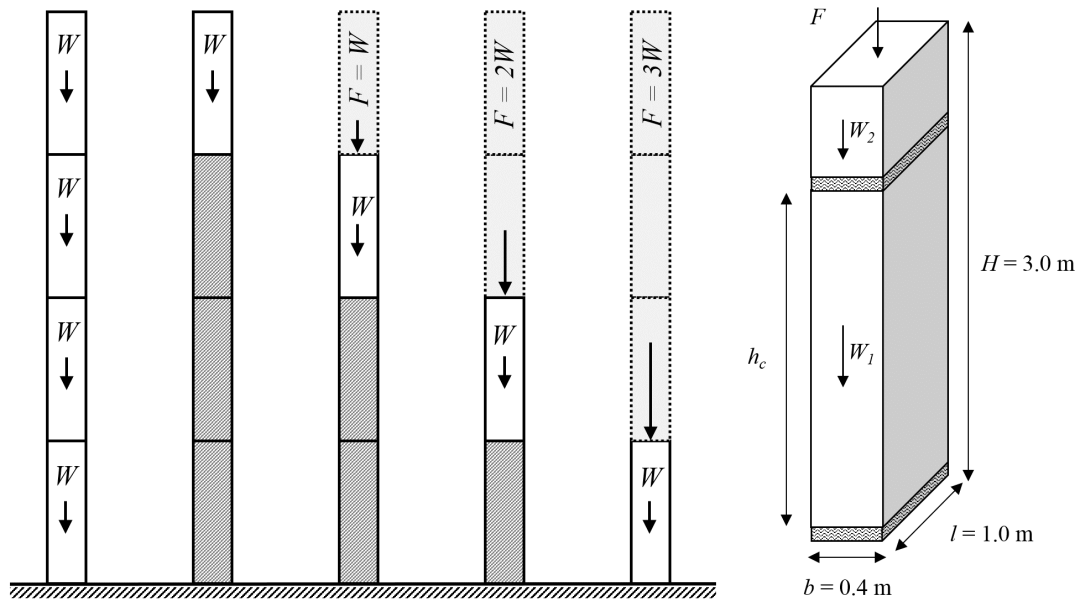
Typical multi-story spanning masonry wall, with corresponding overburden forces for each wall segment (left); geometry of a single wall segment with an intermediate crack at height  $h_c$  (right)
